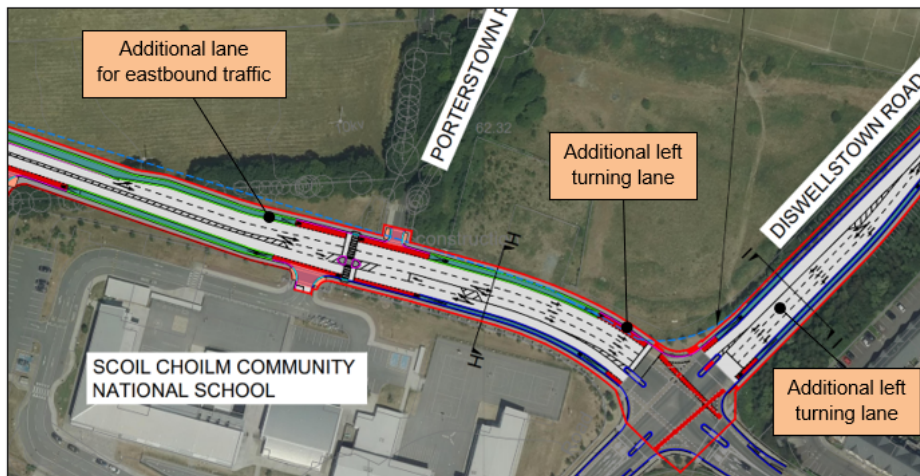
Kellystown Link Road (Source: Public Engagement – Emerging Route Sheet 5 of 5 drawing')
